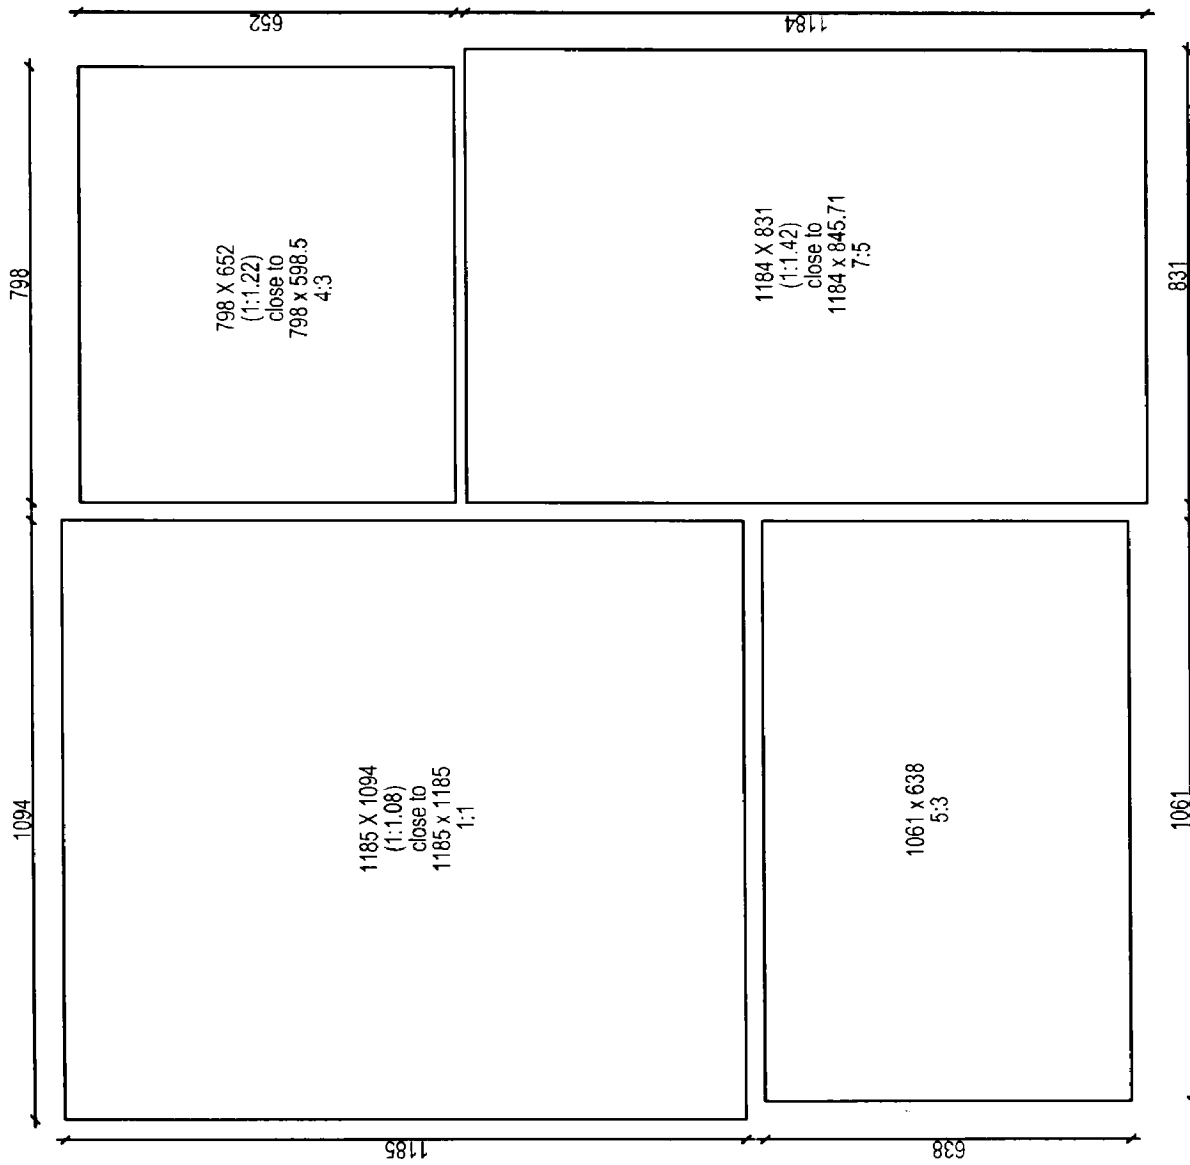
Shodhan Villa, Fourth Floor Plan Of Schematic Analysis
